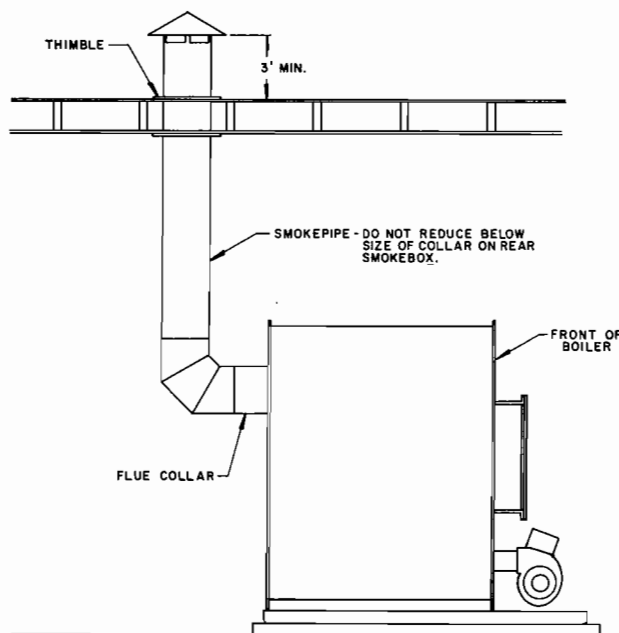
TYPICAL ARRANGEMENT FOR STUB VENT
